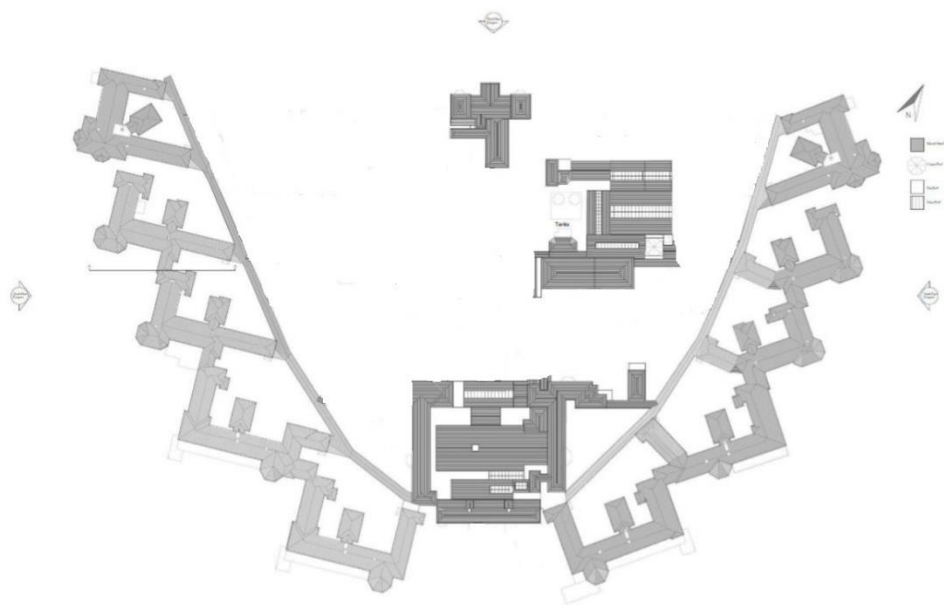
Adapted from Paul Hayes map to illustrate overview of site plan for controlled demolition (Paul Hayes, 2020)
